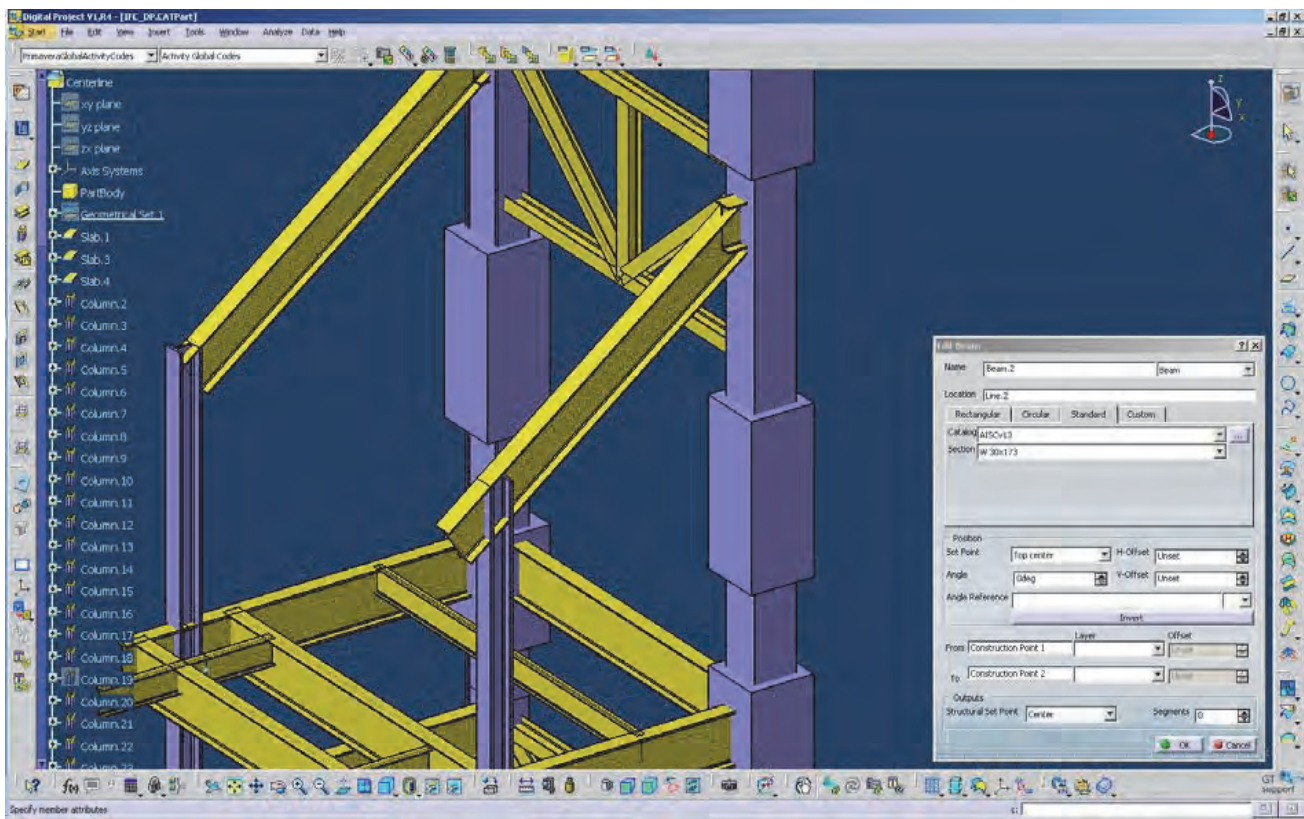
Detailed view of sloped wide-flange beam with properties.
